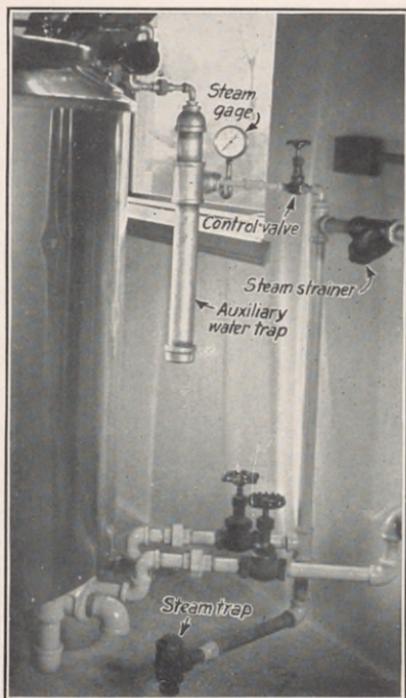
STEAM-CONTROL ASSEMBLY OF AIR-HEATING EQUIPMENT.
